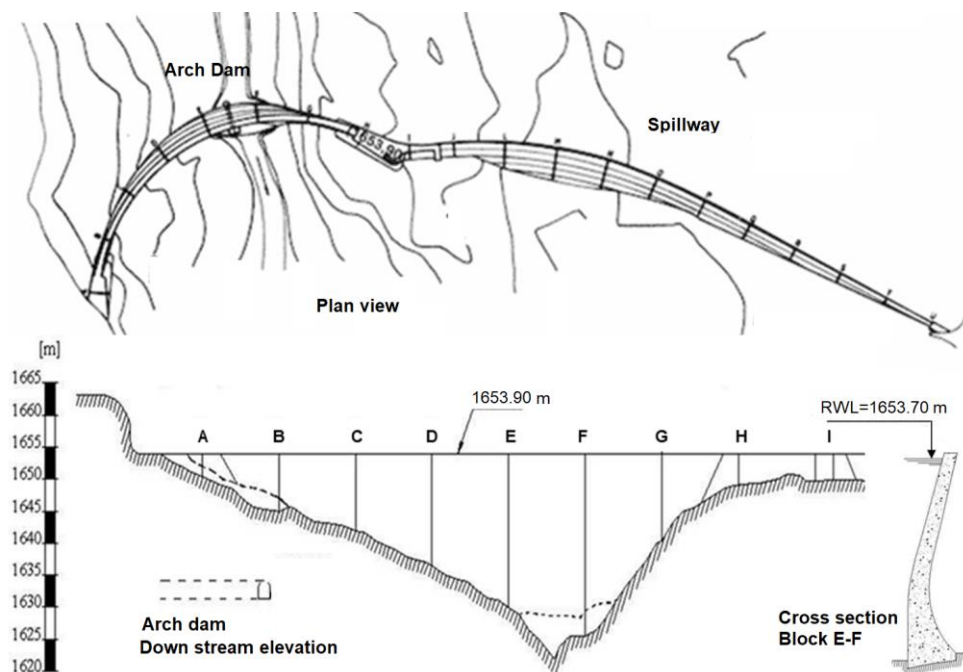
Covão do Meio dam. Plan view, downstream elevation and vertical cross-section of the arch
